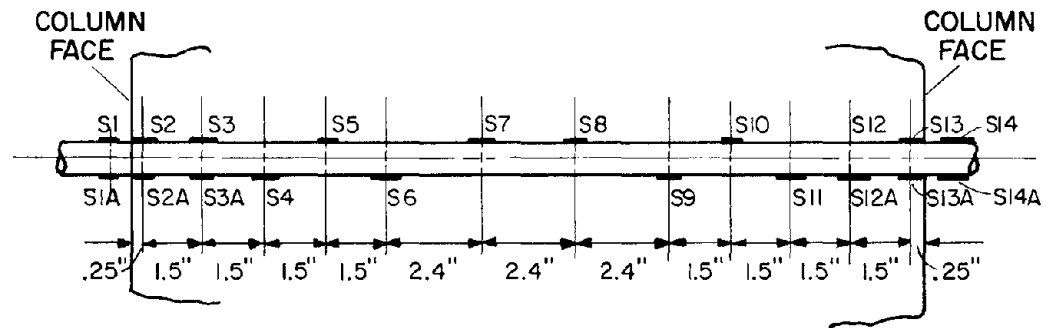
Typical Layout of Strain Gages Along Grooved Bar
